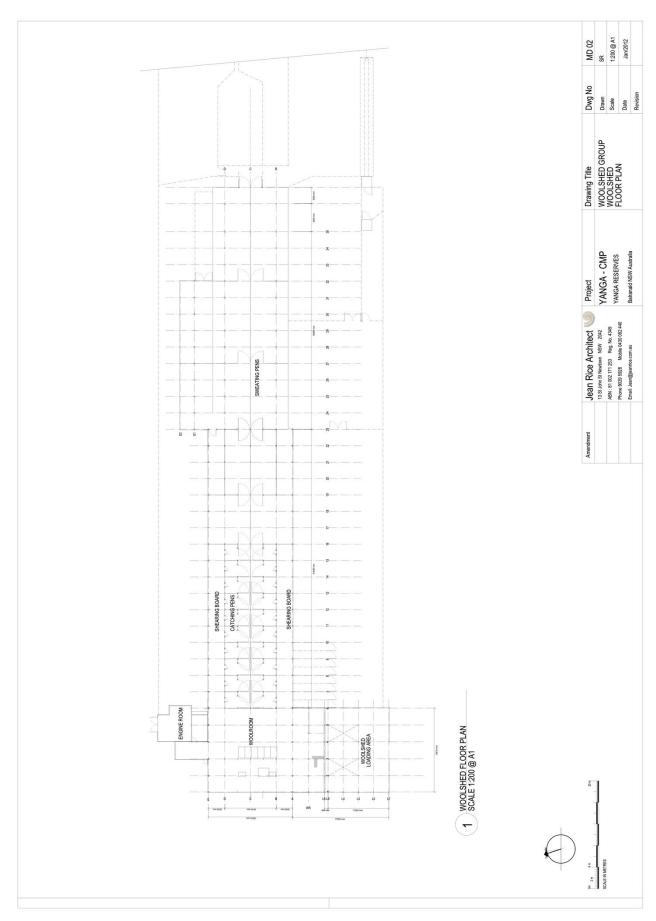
Woolshed Group Woolshed floor plan. Jean Rice Architect, site assessment 2009.
